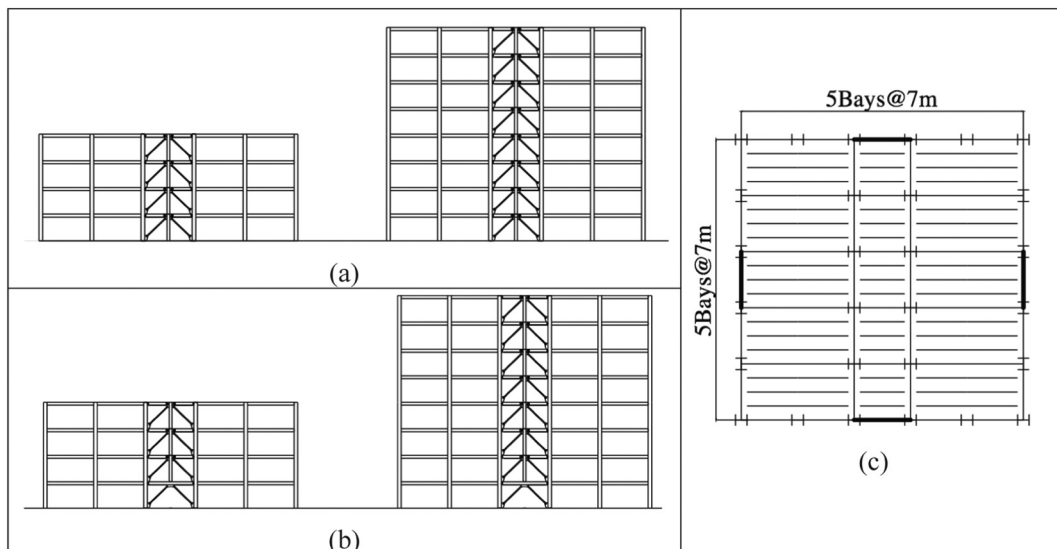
Elevations of (a) STG (b) suspended zipper CBFs and (c) plan view.
